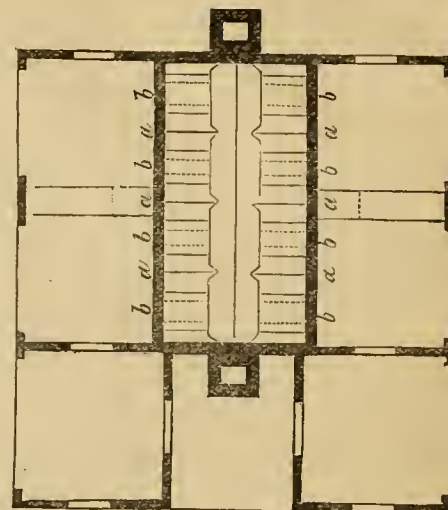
PLAN OF IMPROVED PERMANENT KILN.
